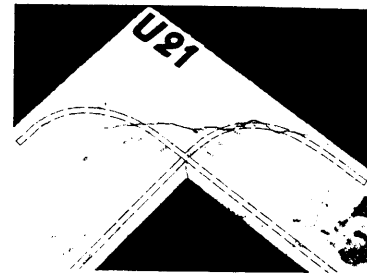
Corner Subjected to Positive Moment (Tension on Inside; Reinforcement Drawn on Surface; Diagonal Crack Caused Sudden Failure)
